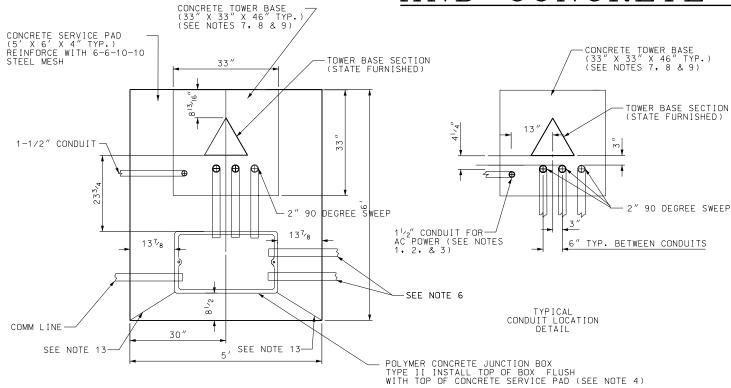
# PHOTOCELL FOUNDATION DETAIL (FRONT VIEW)
